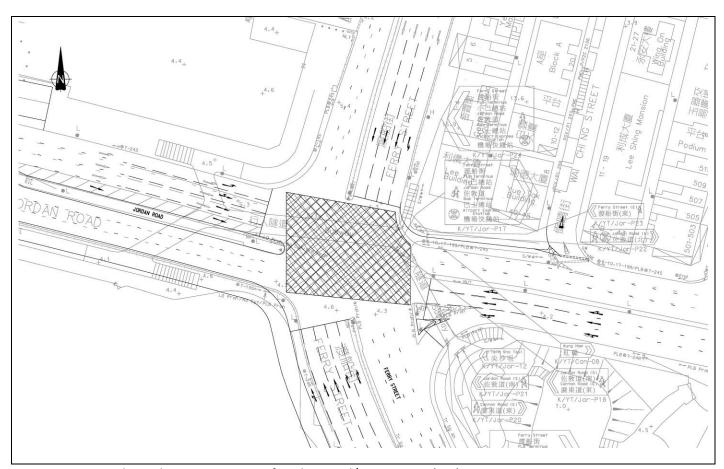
Planned Junction Layout of Jordan Road/Ferry Street (J12)
